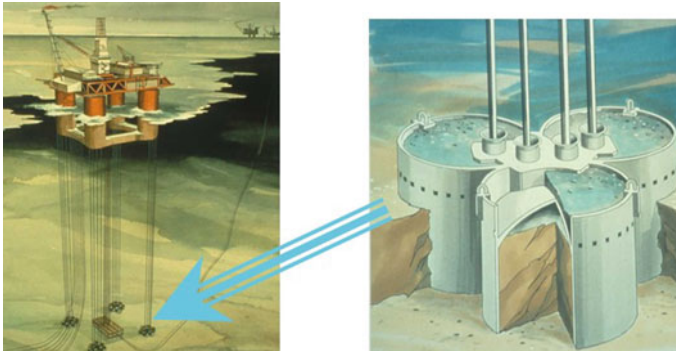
Snorre TLP with detail of anchor (Andersen et al. 1993)
